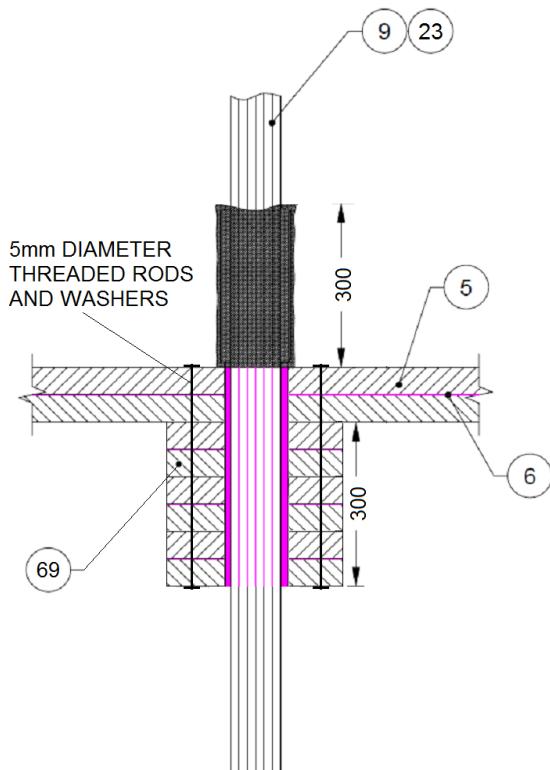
Section View of D1 and D2 Cables with Cable Trays in TBA Firefly™ Intubatt not Against Wall Construction in Horizontal Substrates - Wrapping top side
